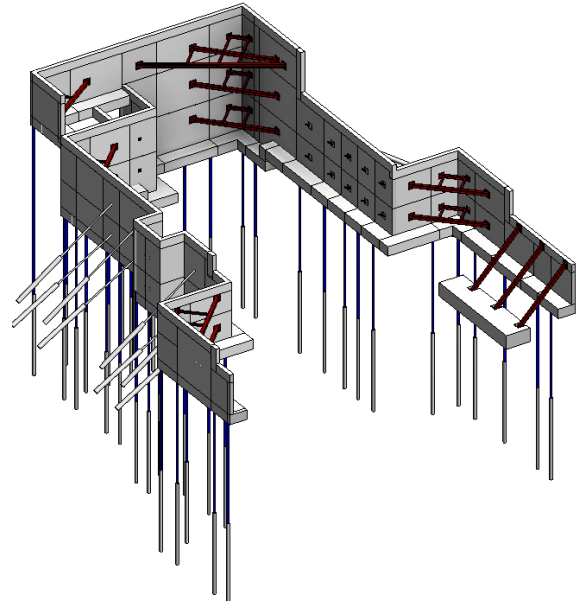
Excavation and peripheral earth retaining solution (BIM model in software Revit).
